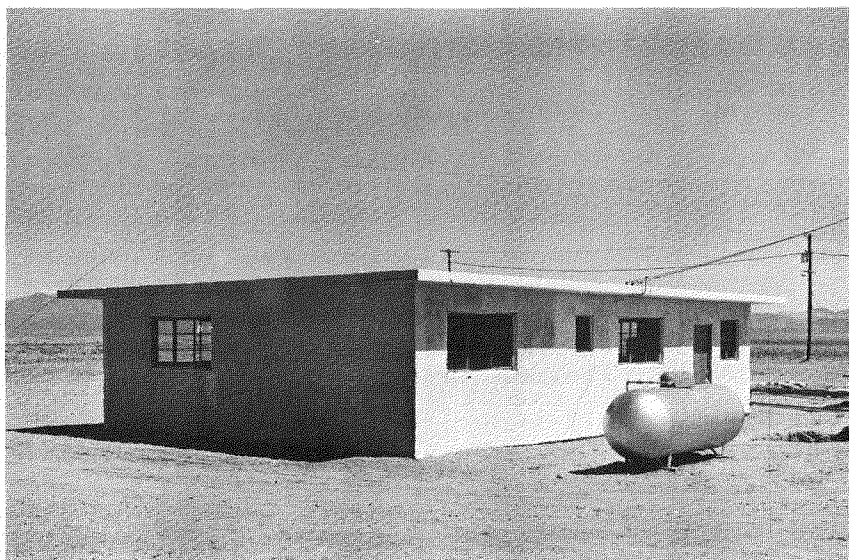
Reinforced precast concrete house before a nuclear explosion, Nevada Test Site.
